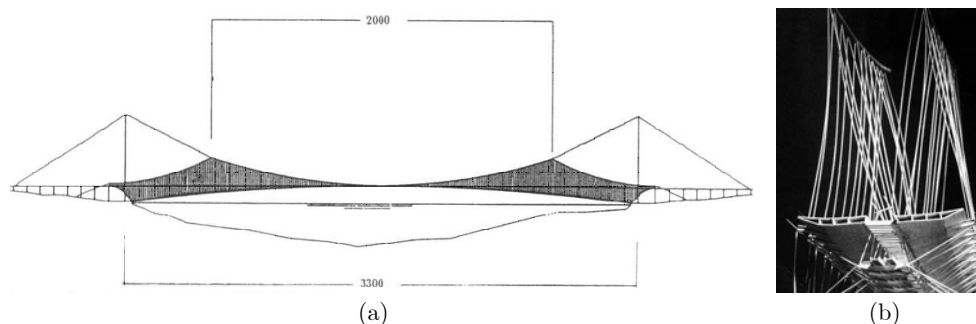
Musmeci's suspension scheme (a) and detail of the bridge deck (b)
